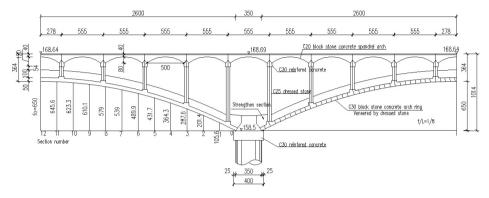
All open spandrel light stone arch, Guanyin Bridge.
